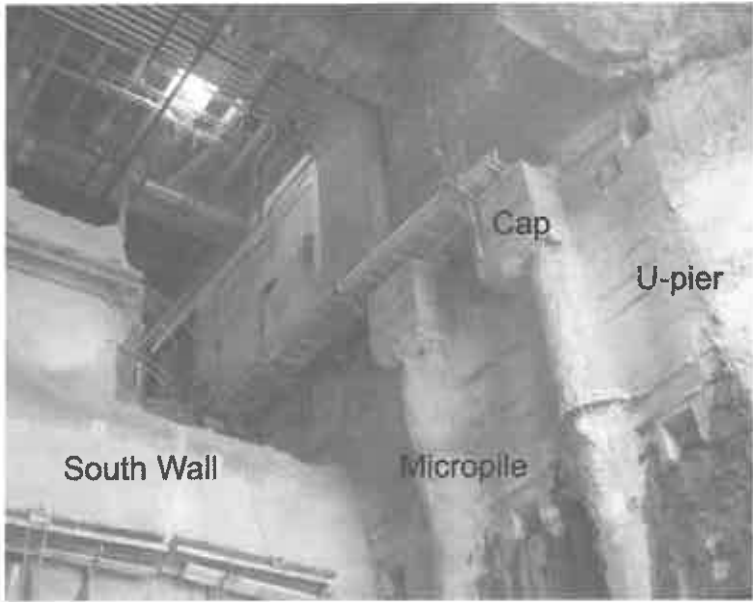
East Pavilion Building - Looking up at underpinning pier, micropile and south wall work
